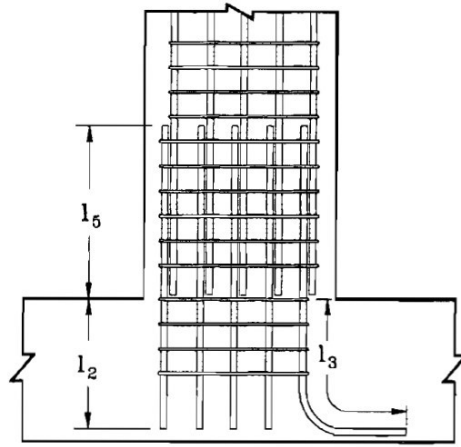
Deficient Column Construction Requiring Retrofit (Priestley et al., 1996).
